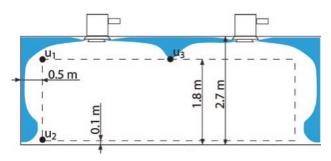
Critical points where air velocities should be checked (u_1 detachment point, u_2 floor area and u_3 colliding point at the boundary of the occupied zone). [4]
